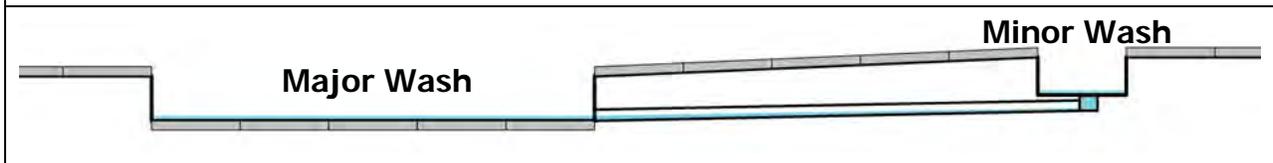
Scenario 39: Plan View of the Test Model - Elevation
